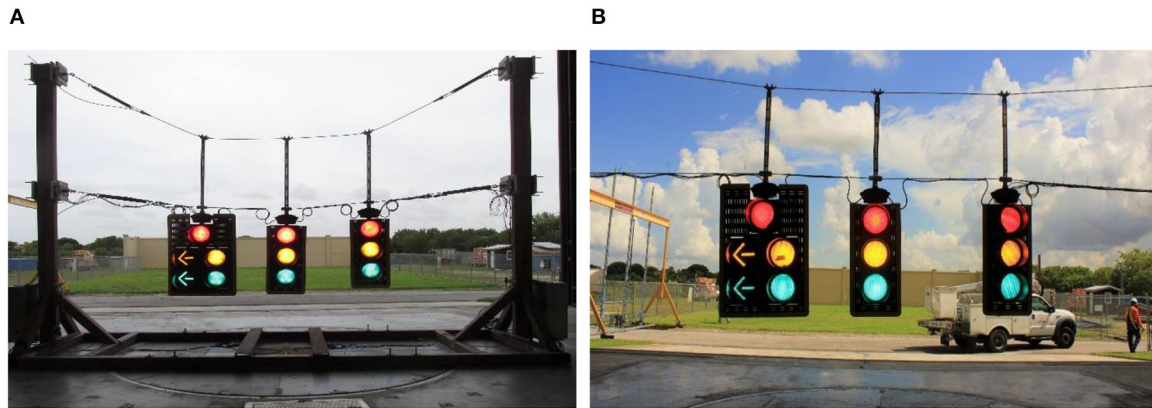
| Full-scale specimens: (A) short-span, (B) long-span.
